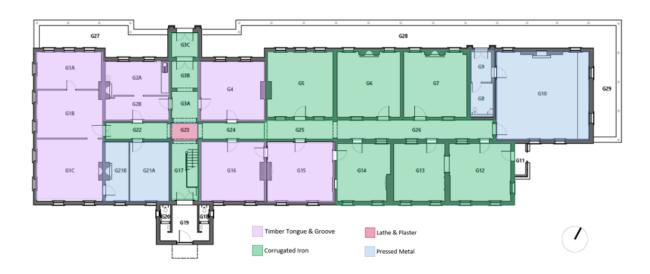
Ground Floor Ceiling Type Plan of the CME Building
